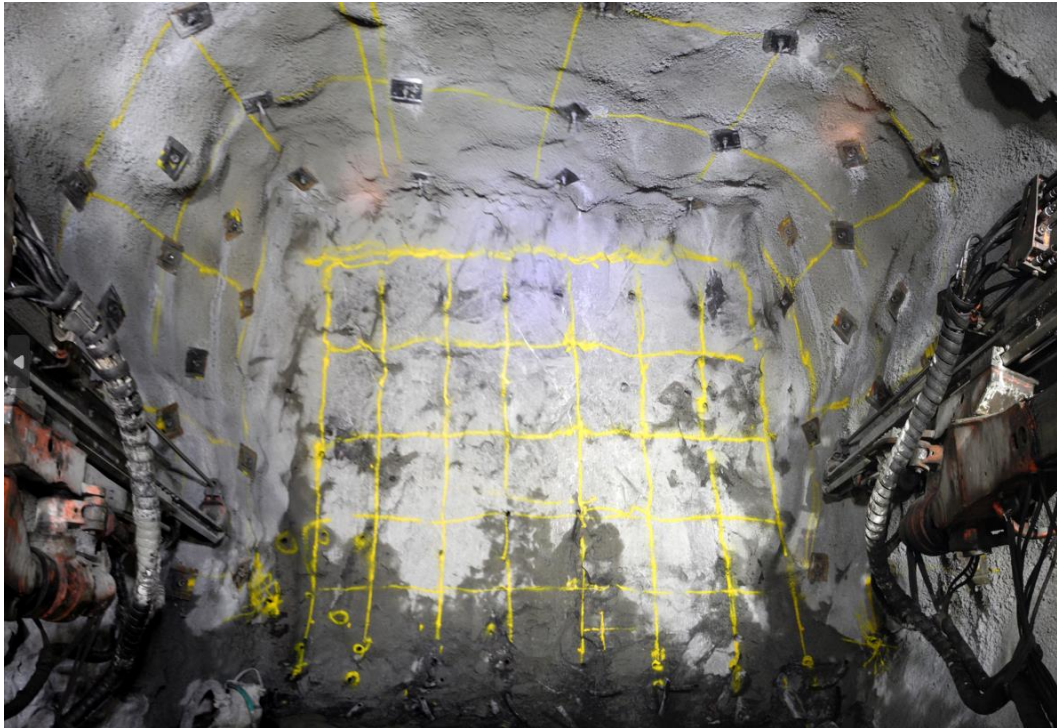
Illustrates an excavation supported with shotcrete and roof bolts (Masole, 2022).
